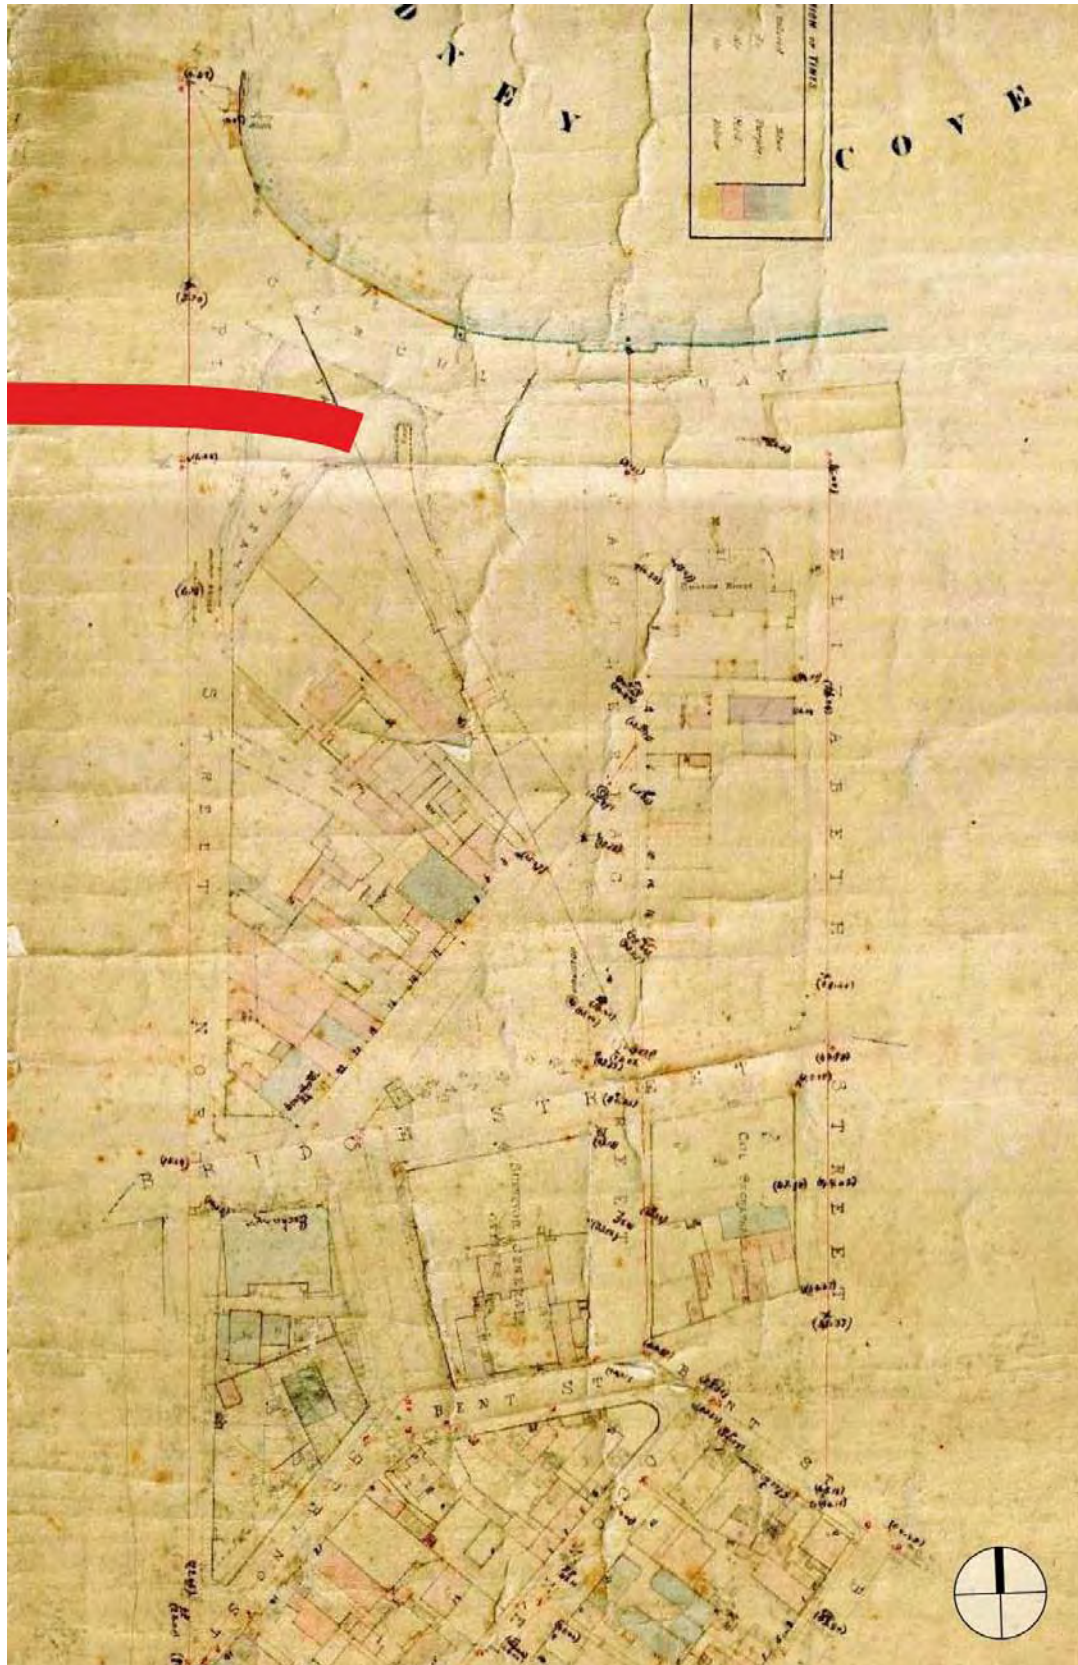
Detail Plan of the extension of Semi-Circular Quay, 1854, showing the plan for the timber piles and decking, as well as the intended extension of Pitt Street and the proposed culvert for the Tank Stream. (Source: State Records NSW AO Plan 1282)
